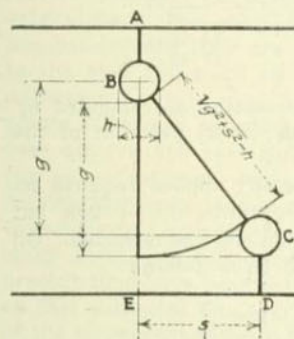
MINIMUM STAGGER OF RIVET HOLES
